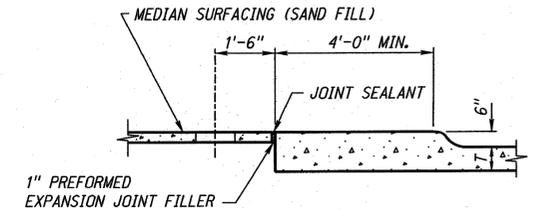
DETAIL FOR CUTTING EXPANSION JOINT FILLER
